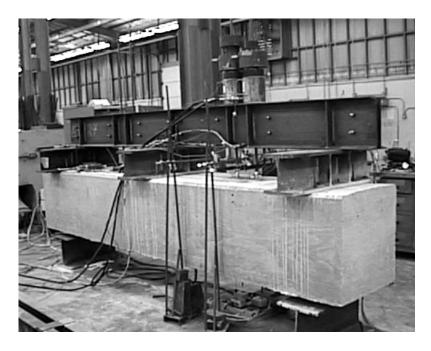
Test Setup for Double-Line Grout Pocket Specimen (Longitudinal Moment)
